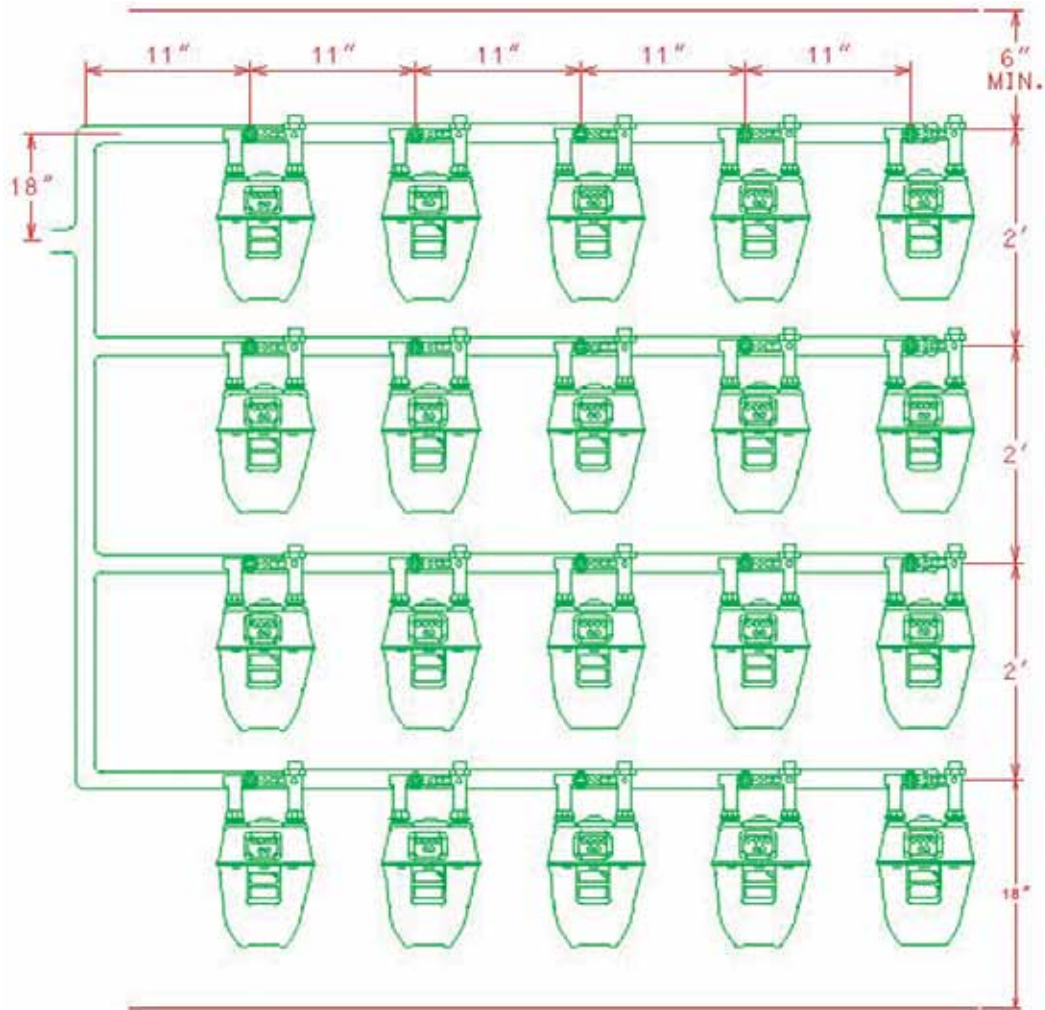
This is a typical inside meter rack where the floor-to-ceiling height is 8 feet or more. MGE would install the rack on an outside wall with meter rows going three high and extending out to accommodate the number of meters desired. This rack will either extend from the wall penetration and go left to right or right to left depending on available space. The dimensions are relatively accurate, but verification of room needs to be done by MGE's Gas Engineering Department. MGE would prefer the gas regulating equipment to be outside, but if circumstances dictate it being inside, we will consider installing it with the meter set. The wall to the front face of the meter will be approximately 18 inches. MGE requires the contractor to install meter protection posts and brackets to protect the rack/meters from damage. All designs of this and clearances will be verified by the Gas Engineering Department. MGE also requires the contractor to core holes in the wall of the building so associated gas pipes can be installed in the basement and vent lines can exit. Exact size and placement will be agreed on at the time of installation. This drawing is to be used as a general reference by engineers, architects, and designers. Loads and meters vary, so actual gas meter racks will likewise vary. Actual design can be verified with the Gas Engineering Department along with questions as to design and placement.
